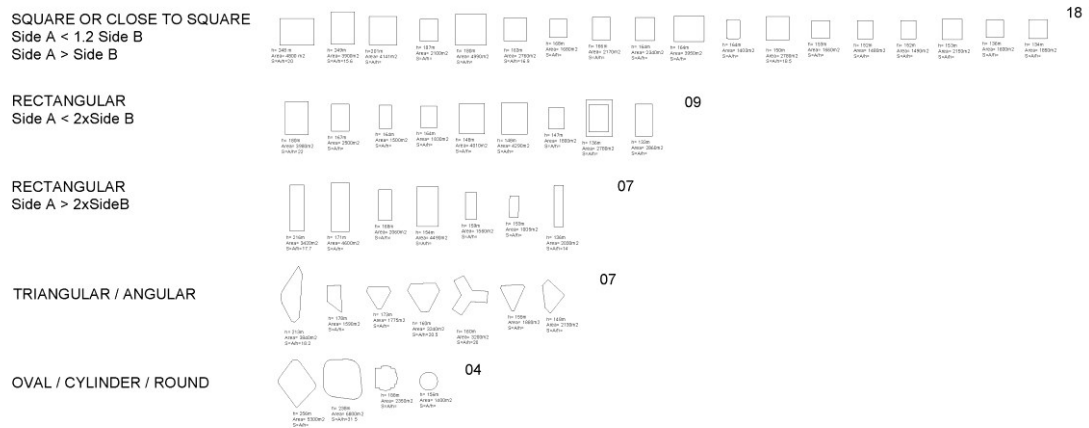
Classification diagrams of Minato Ward's buildings over 130m by its plan footprint geometrical typology, showing recurring geometrical patterns.
